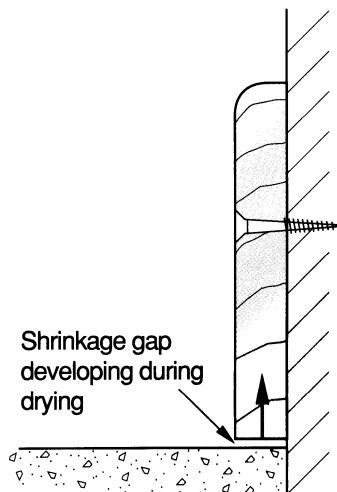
Shrinkage of timber skirtings fitted before they have been fully dried
